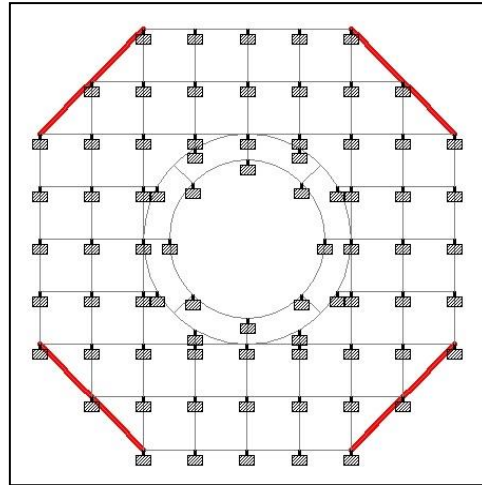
(b). Model 2- Building with shear walls located at chamfered corners
